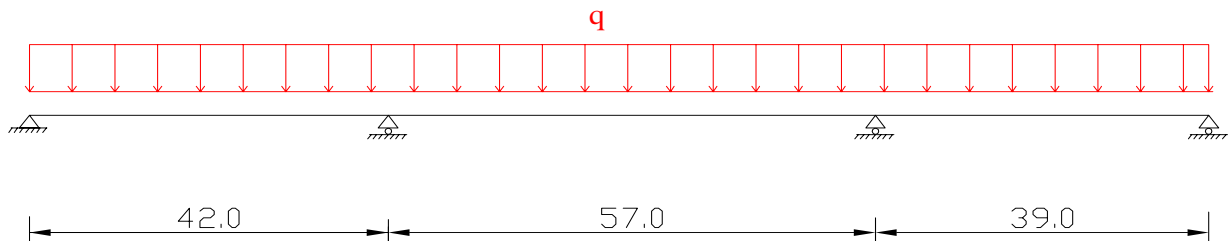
Static model of Bagn bridge (Dimensions given in m)
